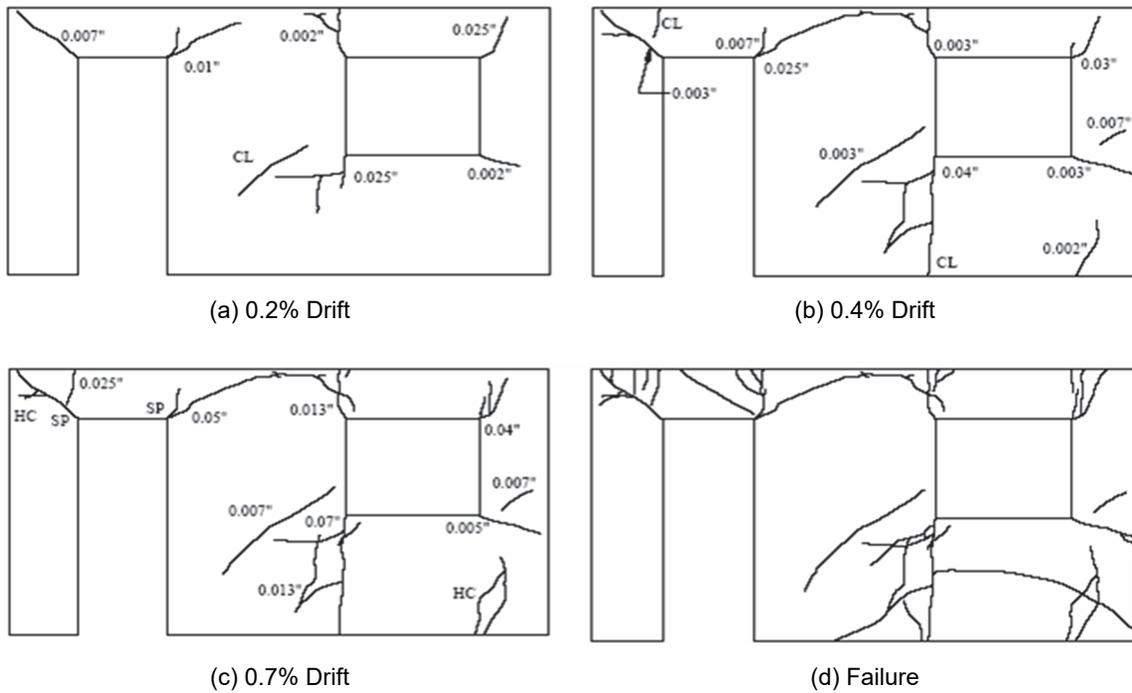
Relationship between seismic drift (racking) of wall and cracking of stucco finish of laboratory test specimen. Here, the “drift” is measured as the ratio of the lateral movement divided by the wall height (image credit: CUREE).
